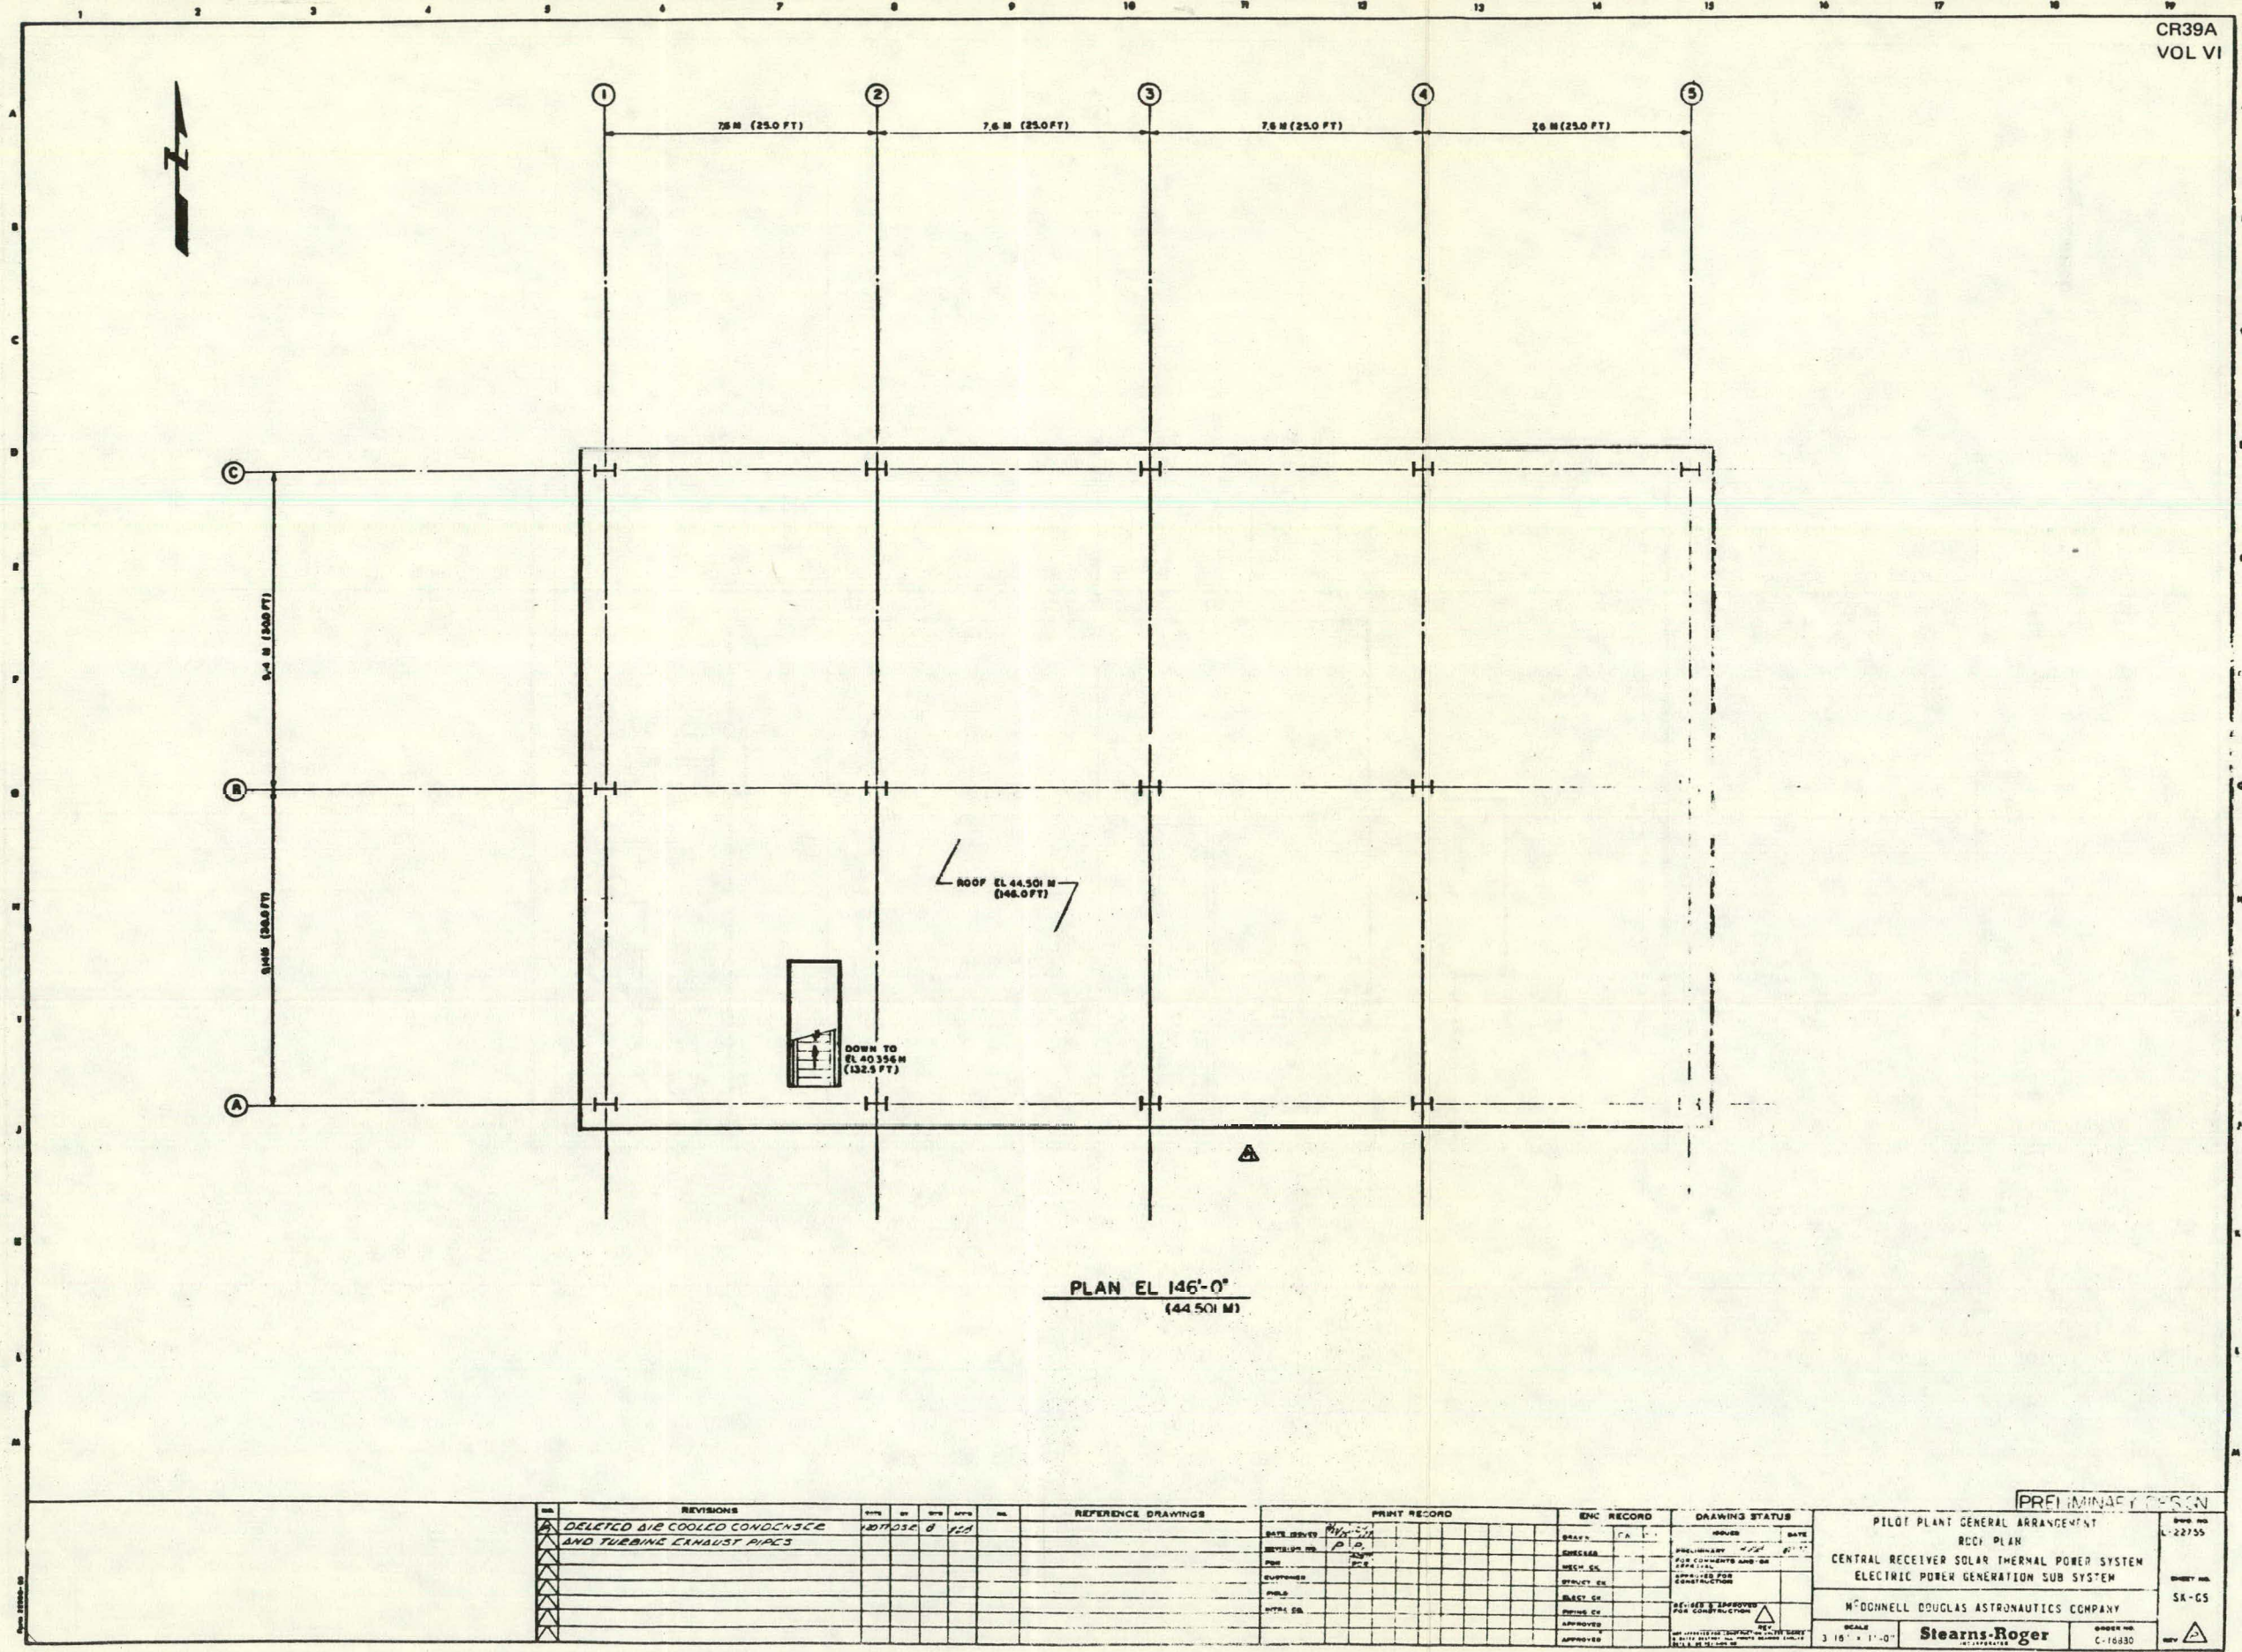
Pilot Plant General Arrangement -- Roof Plan, EPGs
